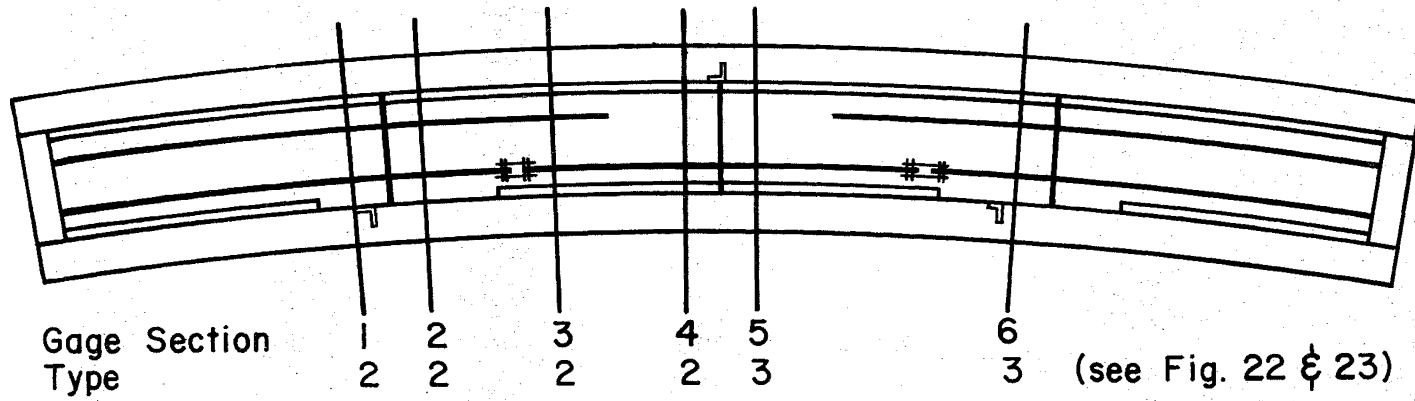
Plan of Box Girder Instrumentation - Girder 3
